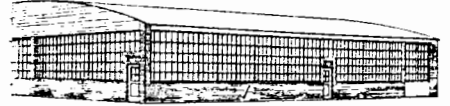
Curve Truss Building—'Leanto' Roof projecting from main structure framed in Truss additional light and ventilate portion of Building.
